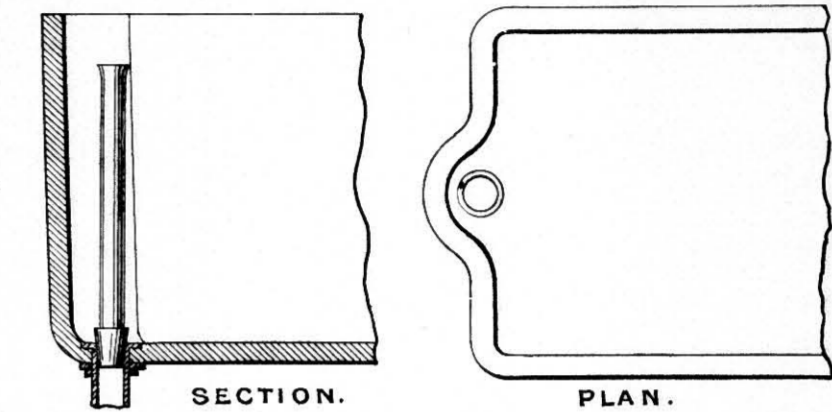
Section and Plan of Combined Waste and Overflow inside Bath.
